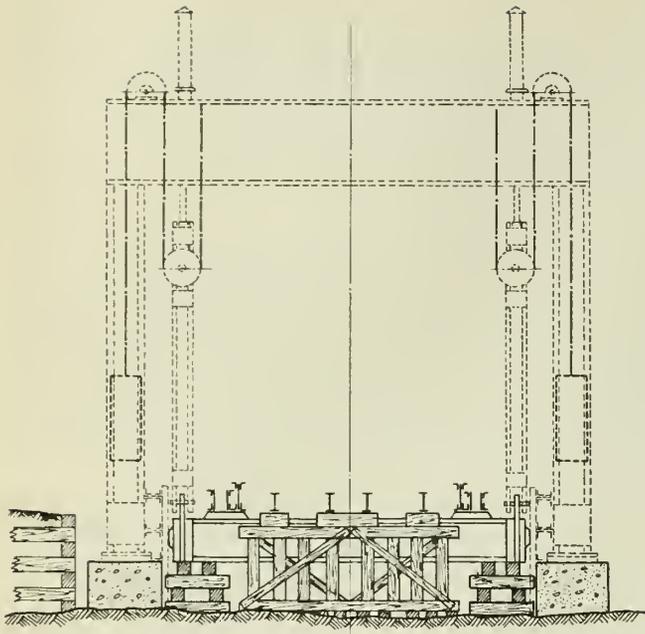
Temporary Blocking under Girder *I* and Stringers of Truss Spans.
